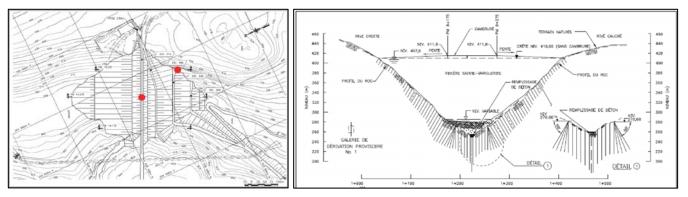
a) Plan view of the Denis-Perron dam, 1b) Longitudinal section of the valley in the central dam axis
